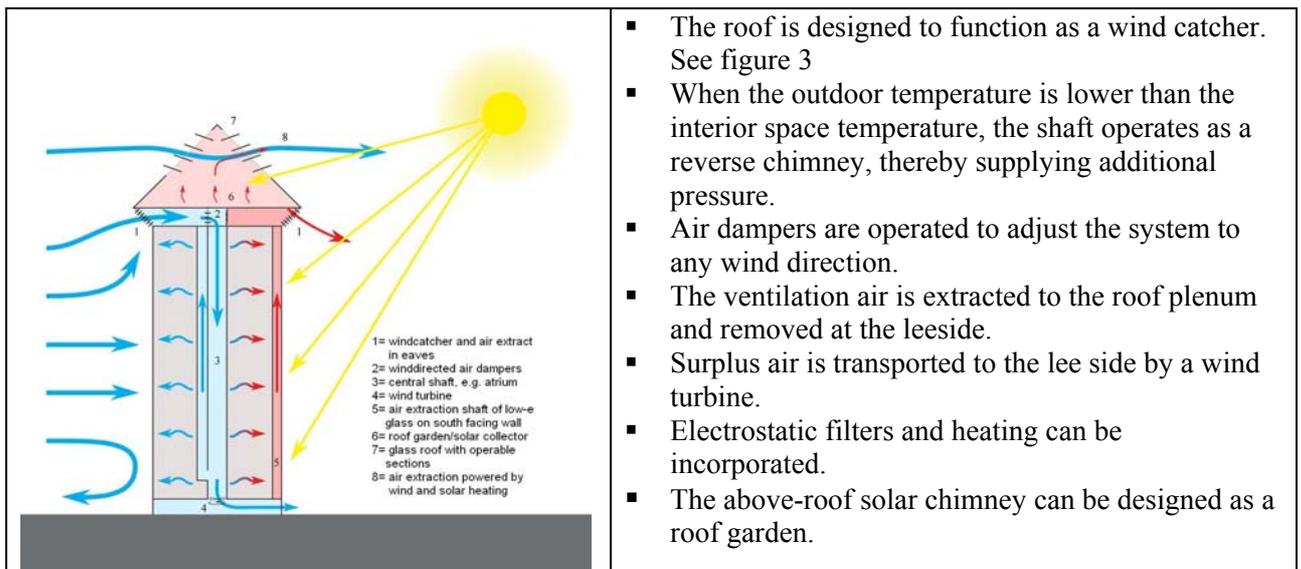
Wind- and thermal driven ventilation + solar chimney with roof garden
